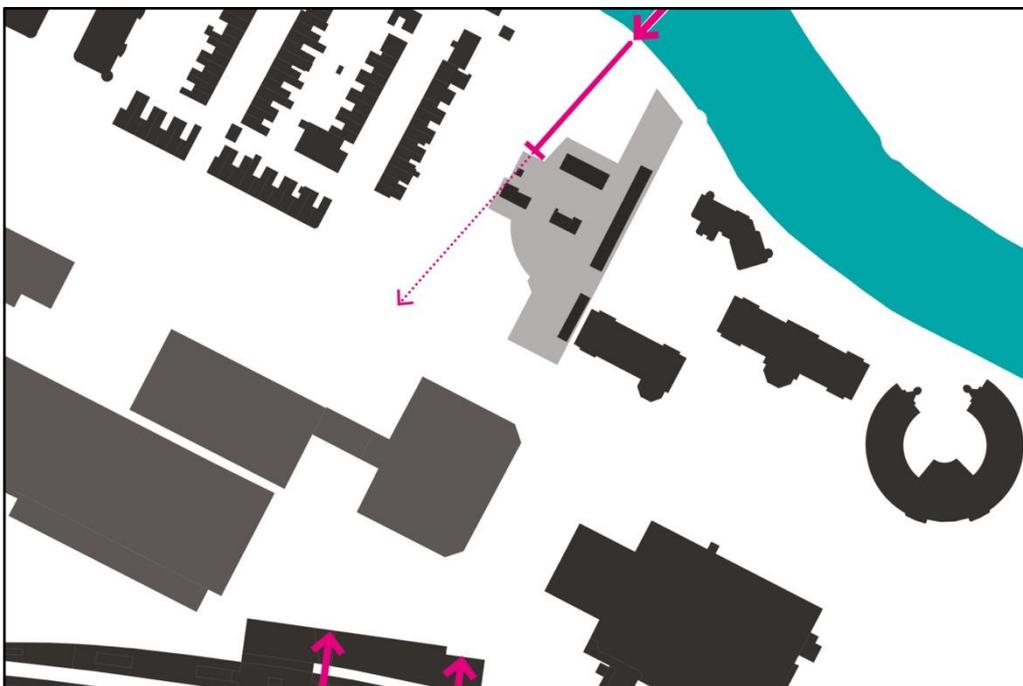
Plan to demonstrate inability to achieve a direct line of sight from Christchurch Bridge to Vastern Road
